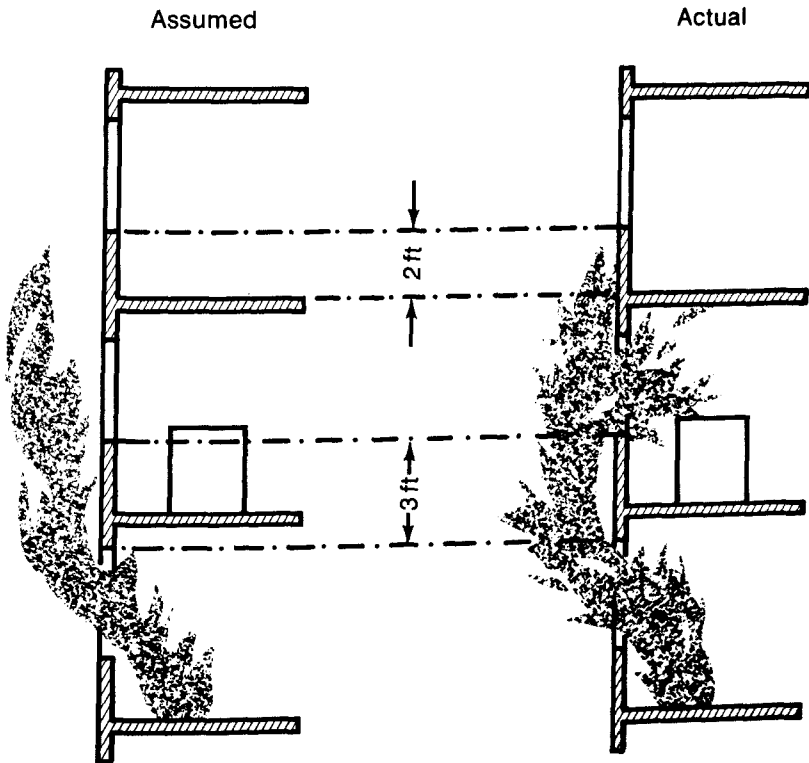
Assumed and actual shape of flames projecting from windows with vertical separation of openings.
